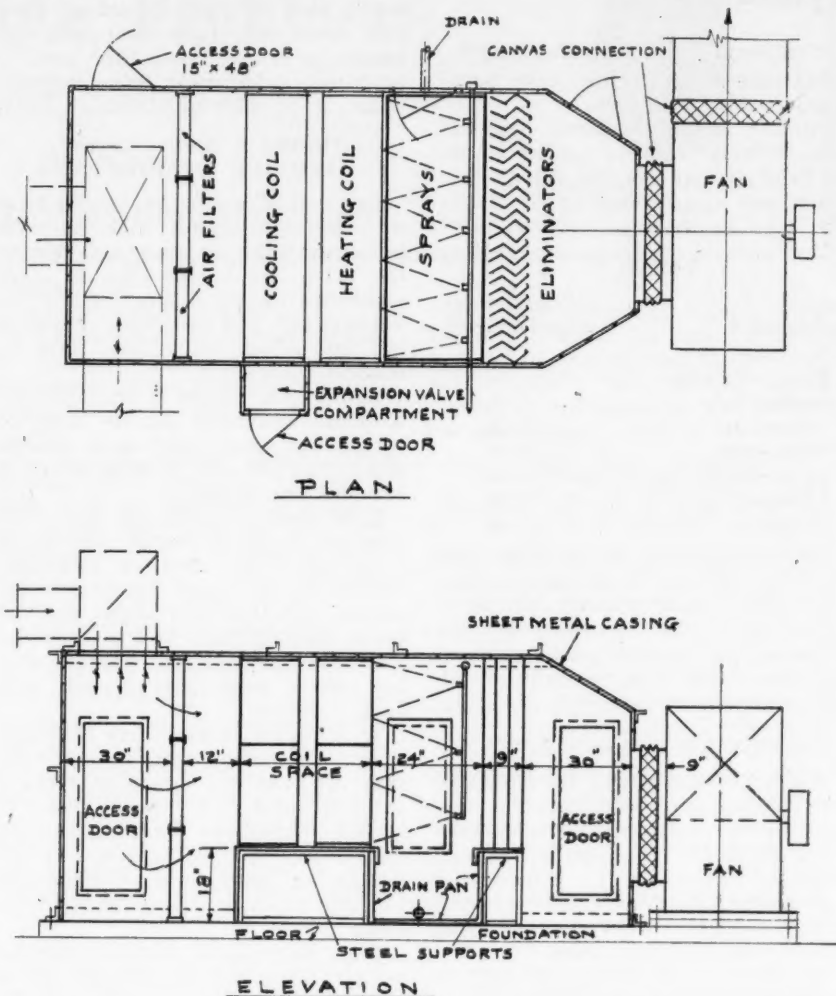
Here are plan and elevation views of a typical built-up casing which houses both heating and cooling coils for an air conditioning system as well as a bank of filters and water sprays.
